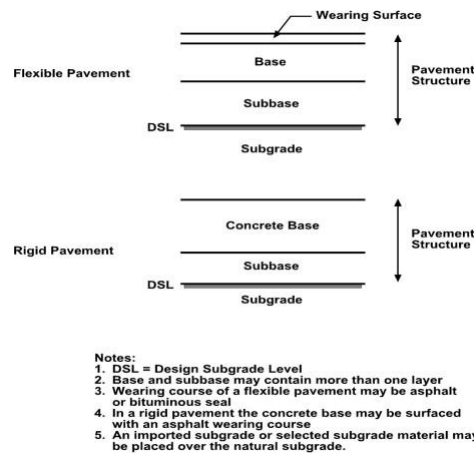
Structure of pavement [Source: Austroads (2004a)]
